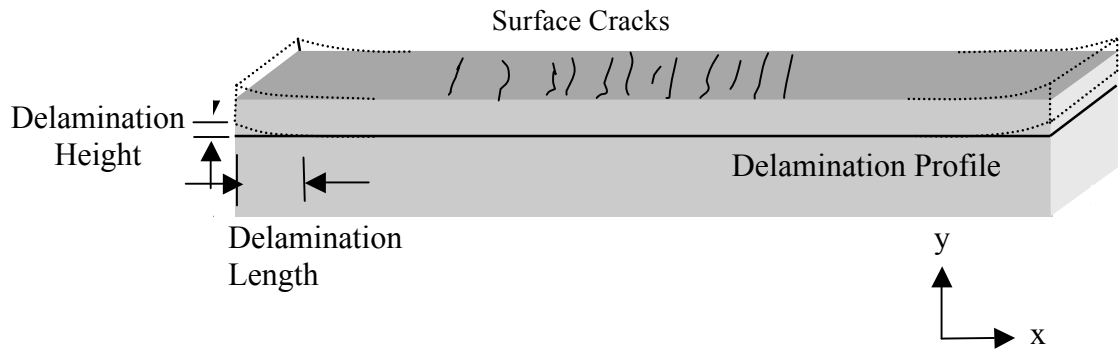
Schematics of typical failure modes in layered repair system.
